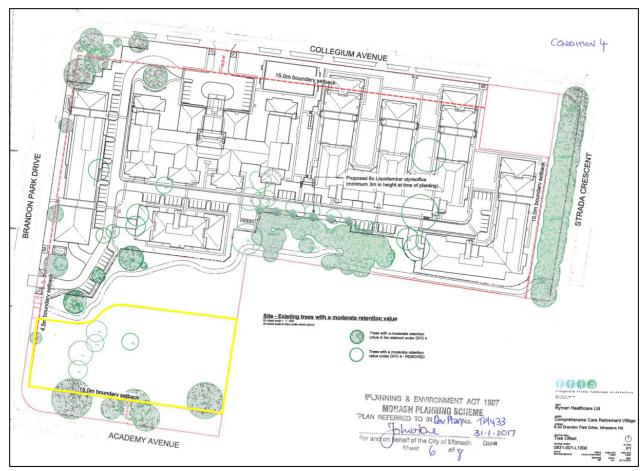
Endorsed Development Plan - Tree Offset Plan, with the Planning Unit identified (in yellow)
